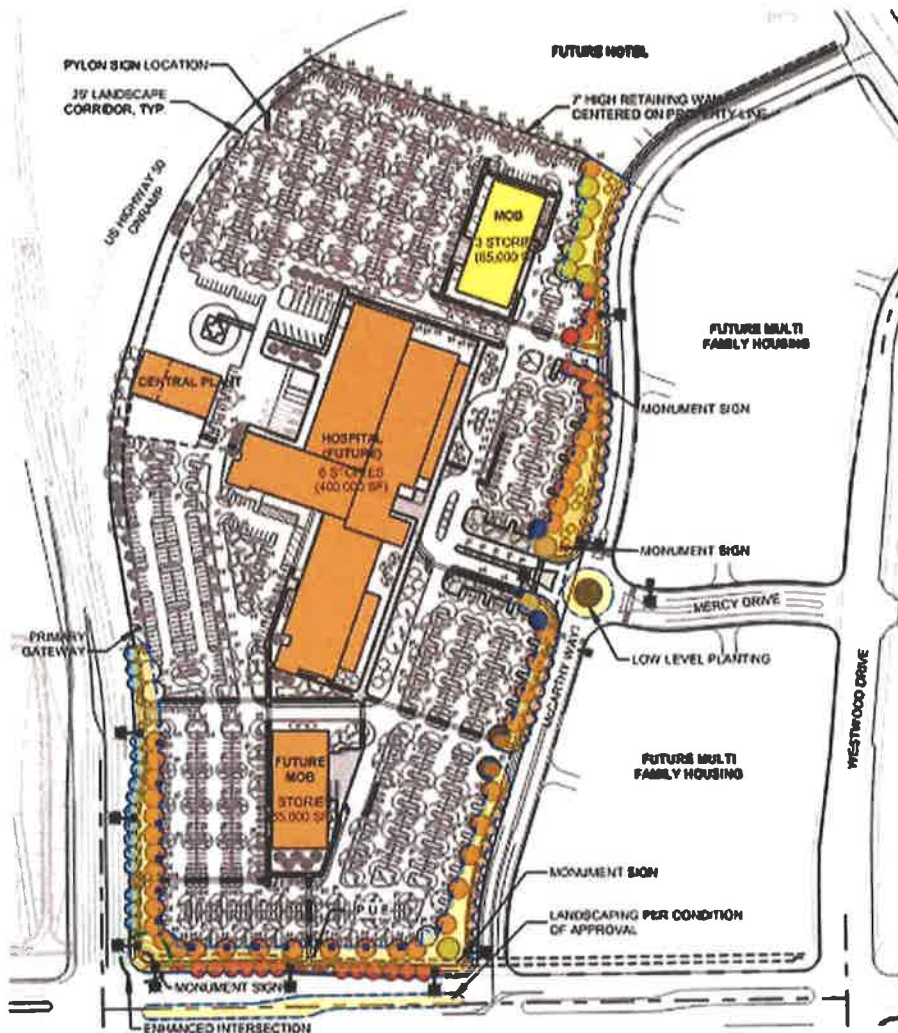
EXHIBIT F STREET LIGHTING AND LANDSCAPING FRONTAGE
